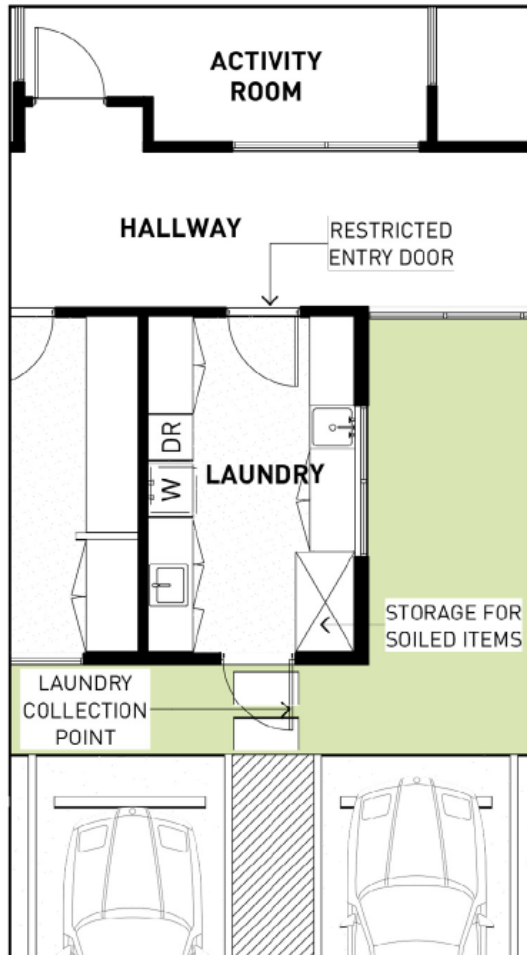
A typical child care facility laundry layout. External access may be provided if laundry is done off site or for deliveries.
